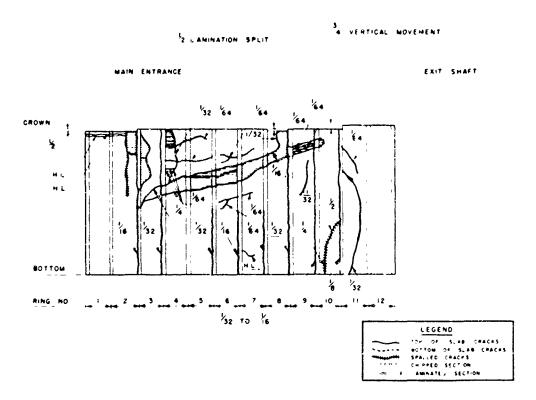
Developed vertical elevation facing GZ, structure II-2.
